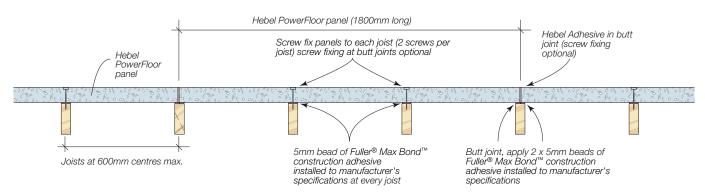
Fixing of Hebel PowerFloor Panel to Timber Joists
